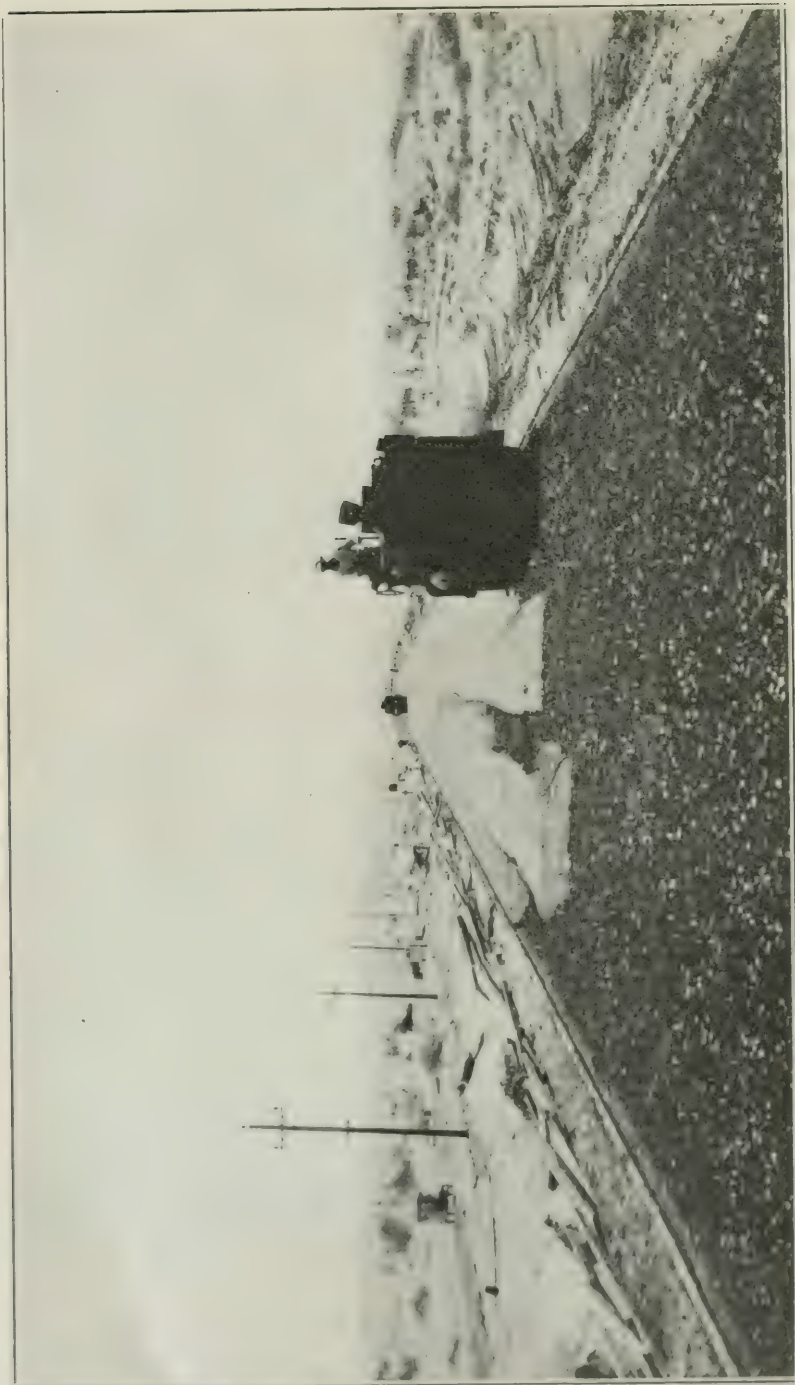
PLATE XL. Constructing asphalt concrete pavement across the Sand Hills in Imperial County.
